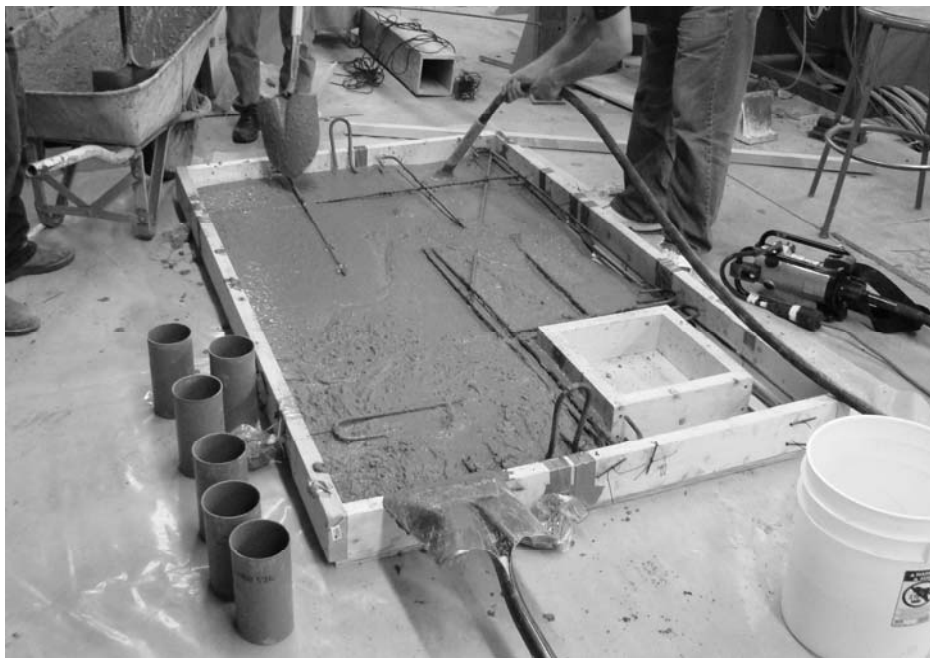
RC specimen during placing and consolidation of plastic concrete
